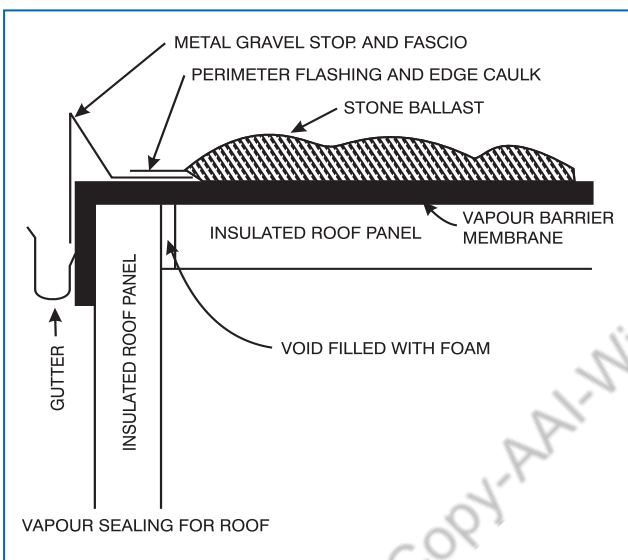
Construction of roof with provision to prevent water falling on panels
